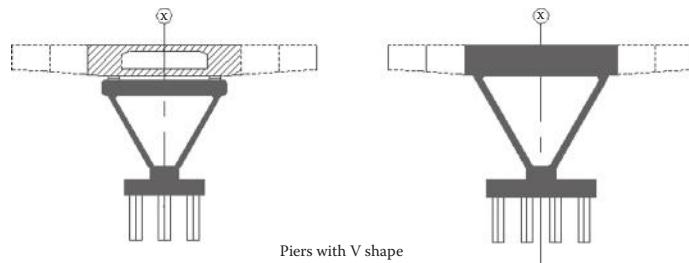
(Continued) Example of fixation at deck to pier in cantilever bridges.
